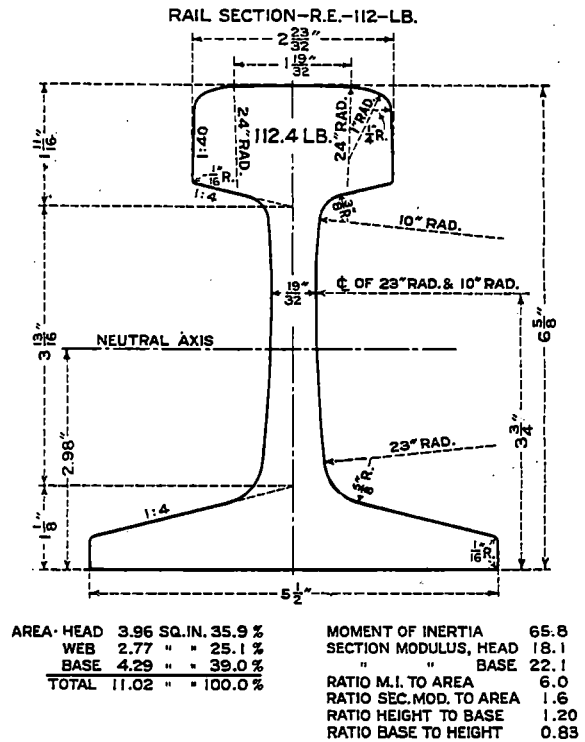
Original AREA 112-RE Rail Section (U.S. Steel #11225).
